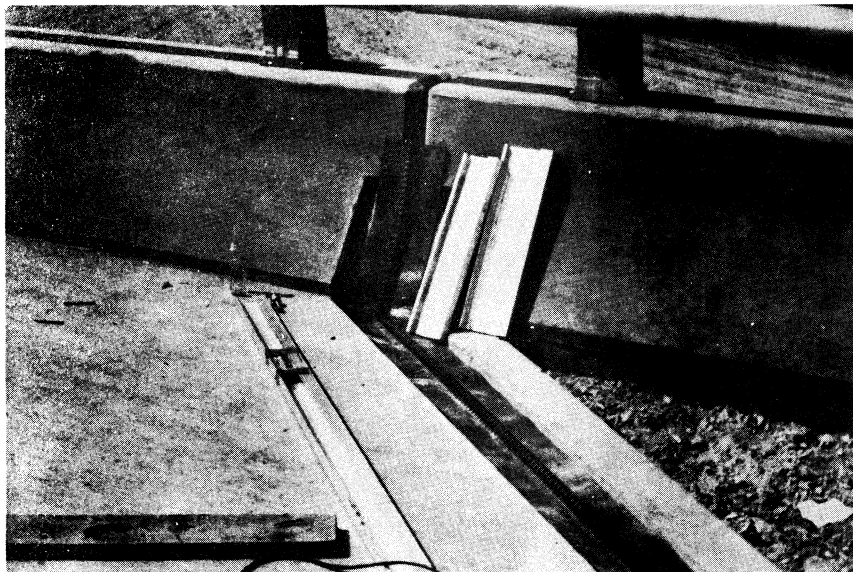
Joint turn-up at the parapet wall showing the elastomeric membrane and the wider panel sections that were used on the wall face.
